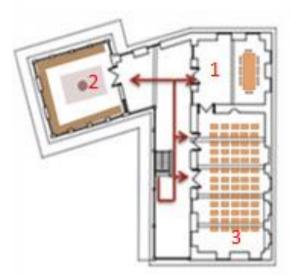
Ground floor plan of the Eaved House (Author, 2015based on Department of Antiquities and Museums original drawings)
